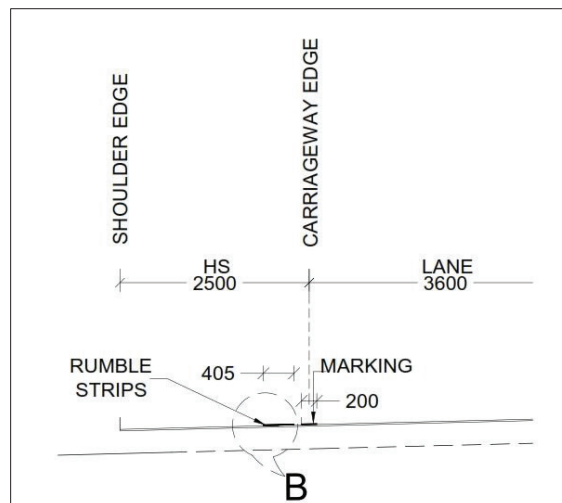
SNAP Marking - Shoulder Rumble Strip Section X-X
